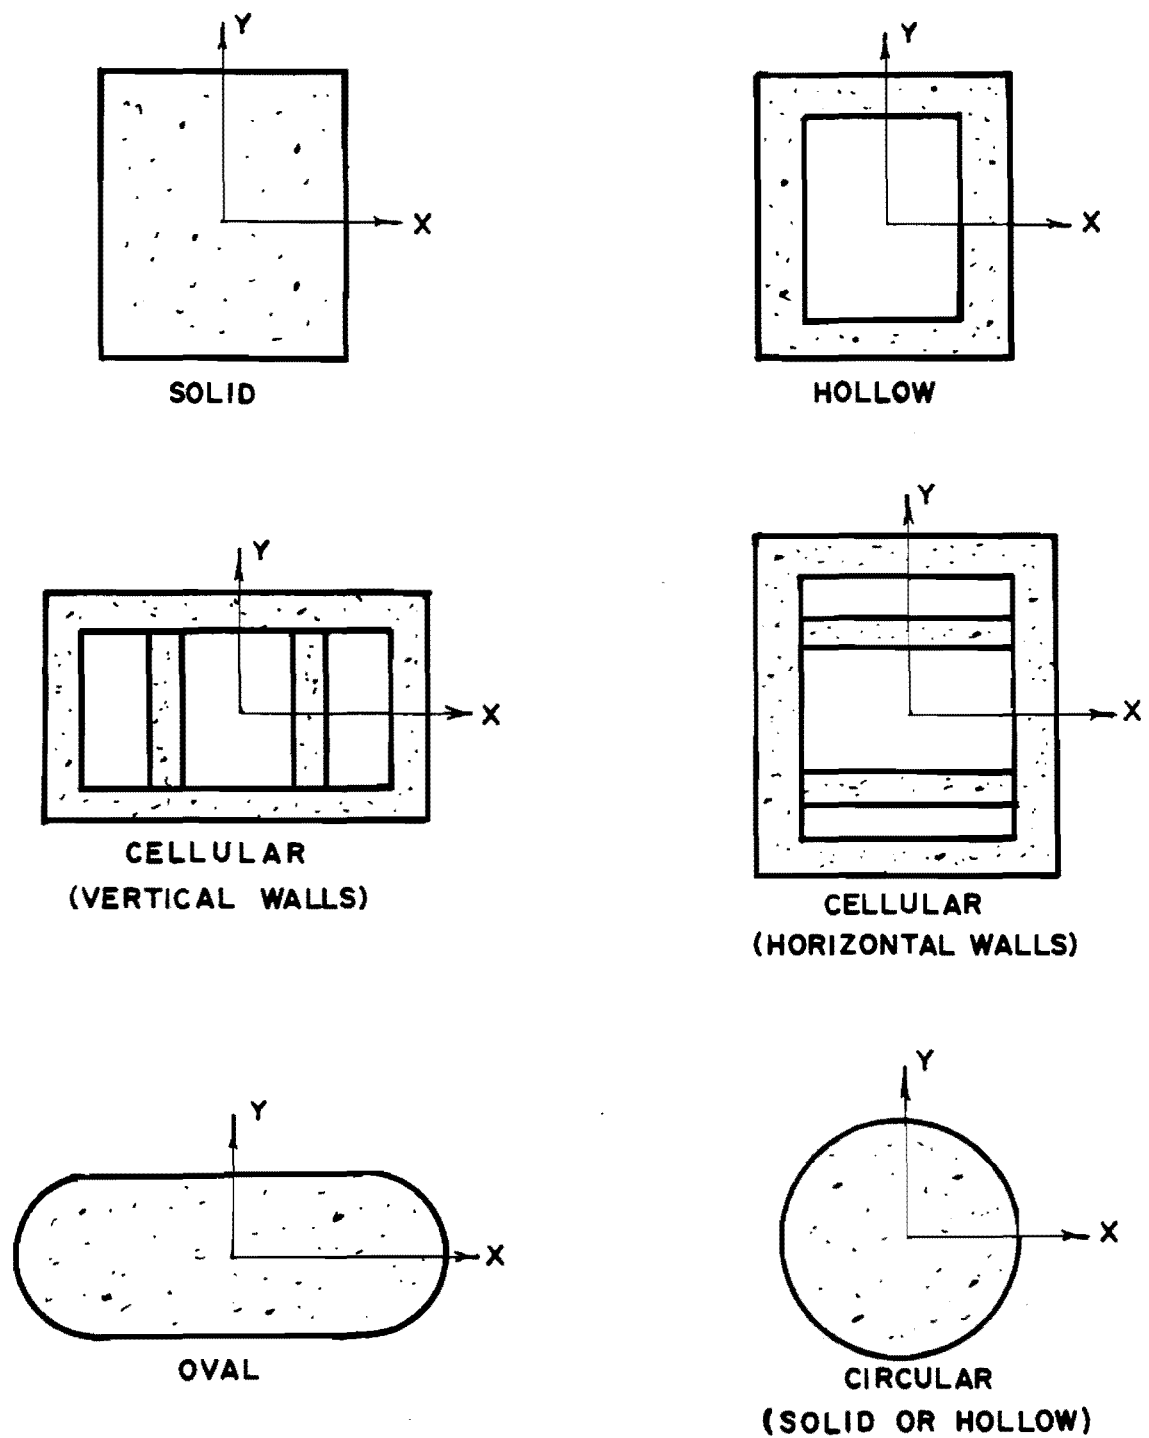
Sections handled by BIMPHI, PIER, and FPIER
